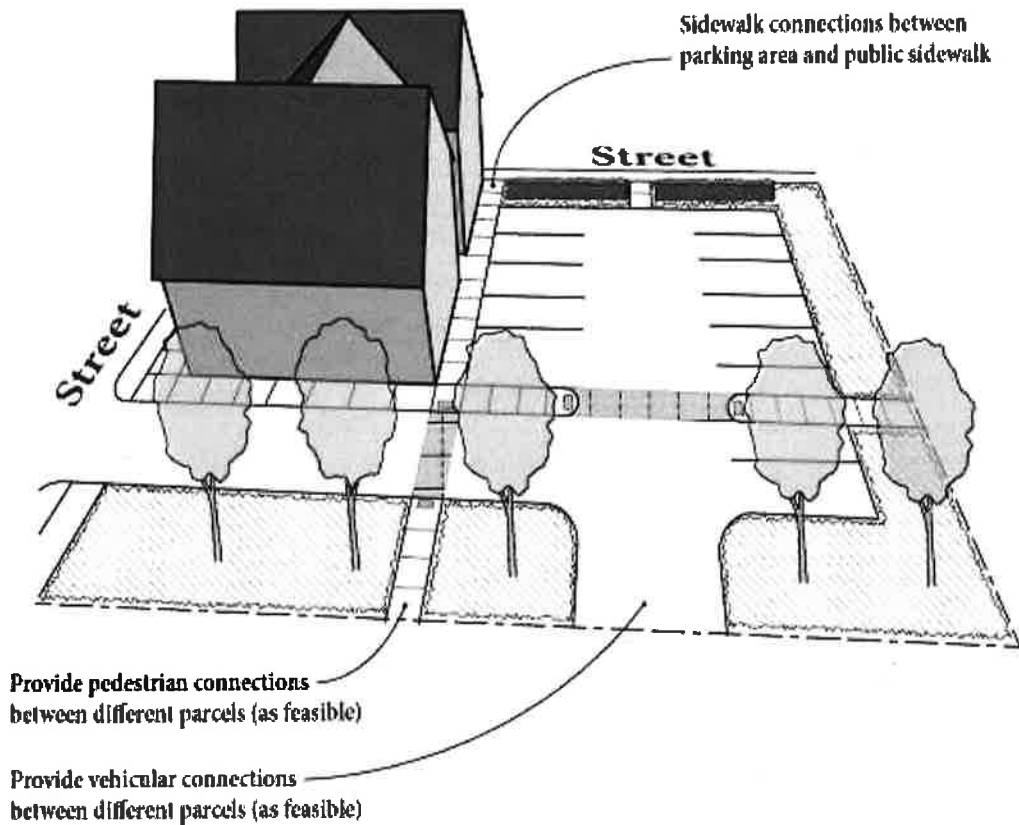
Site design showing connectivity between adjacent parcels and pathways connecting parking areas to the larger pedestrian network.
